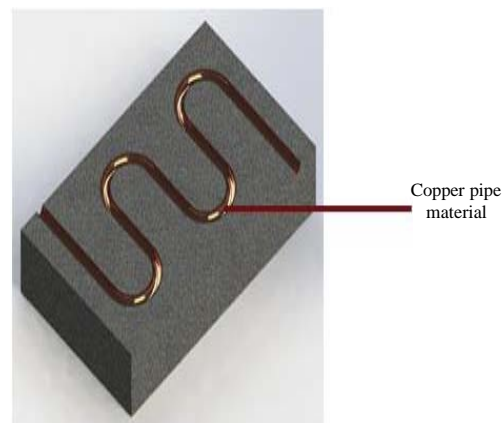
Serpentine copper pipe embedded in asphalt pavement
